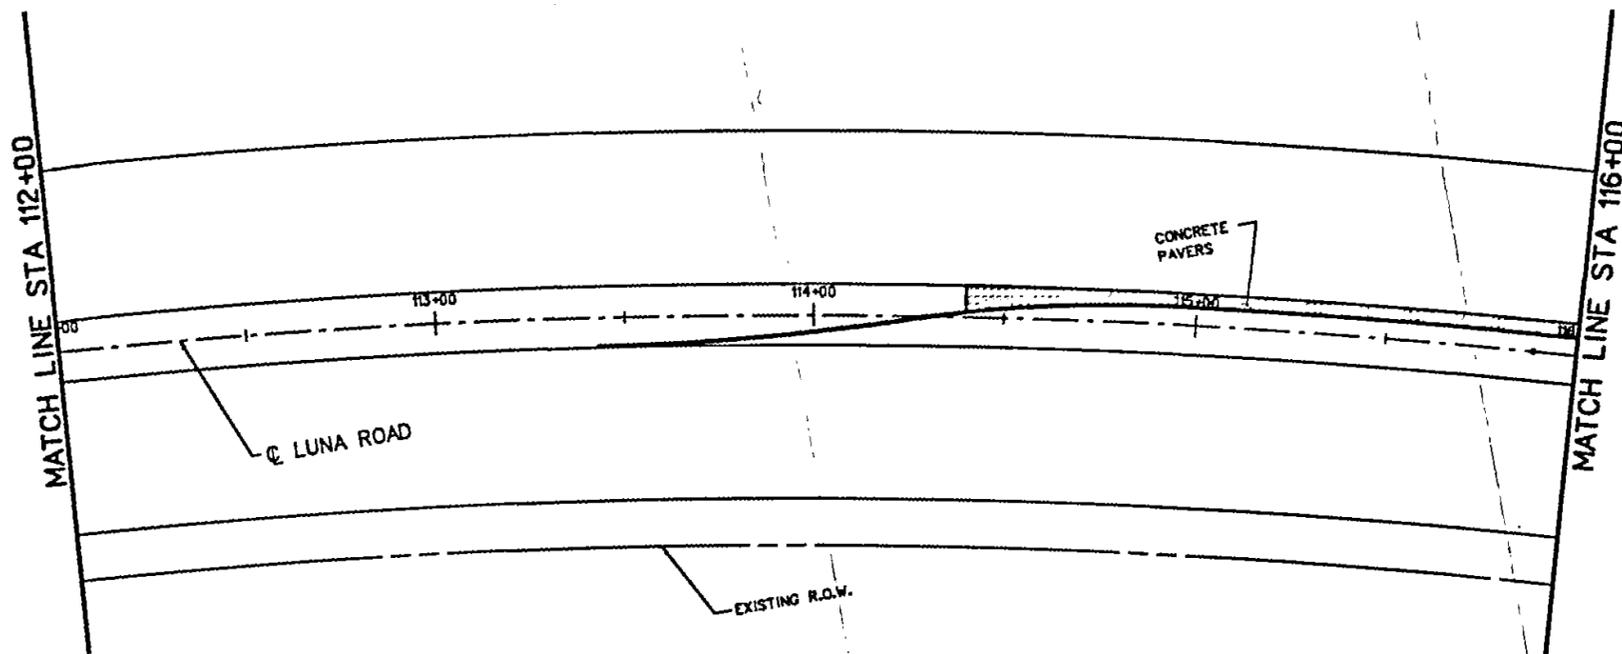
LUNA ROAD INTERSECTION LAYOUT
